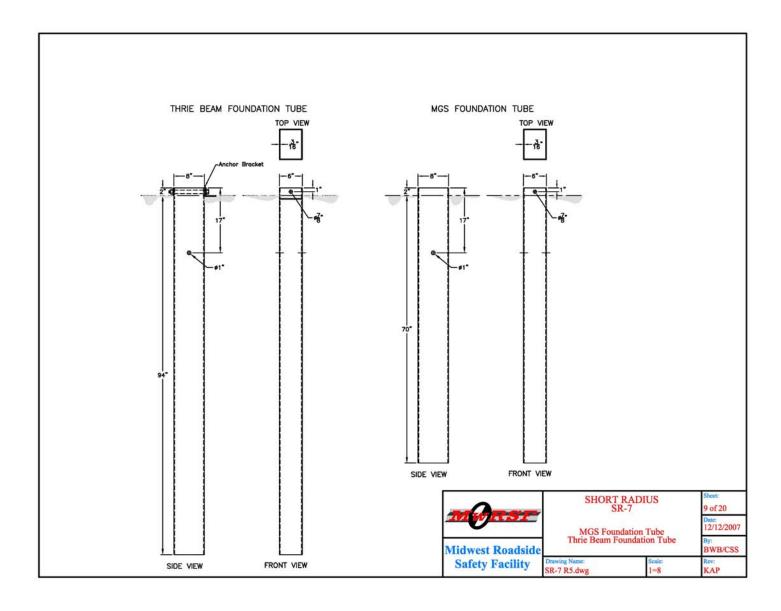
MGS Foundation Tube and Thrie Beam Foundation Tube Details (English)
